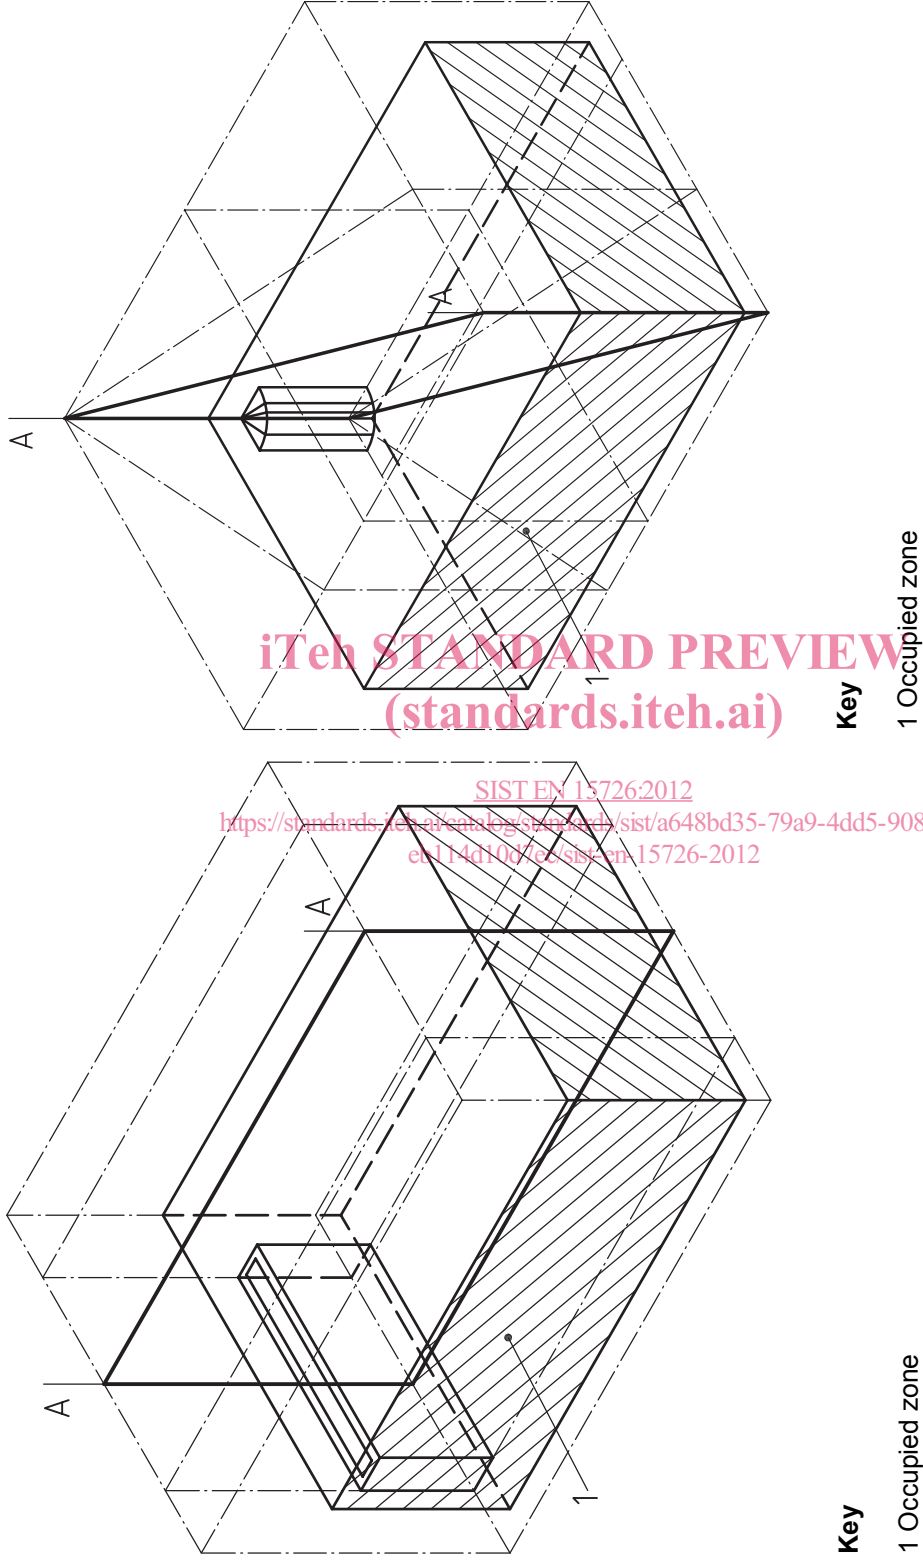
Diffuser (or fan coil) in window or floor position – example of test planes
